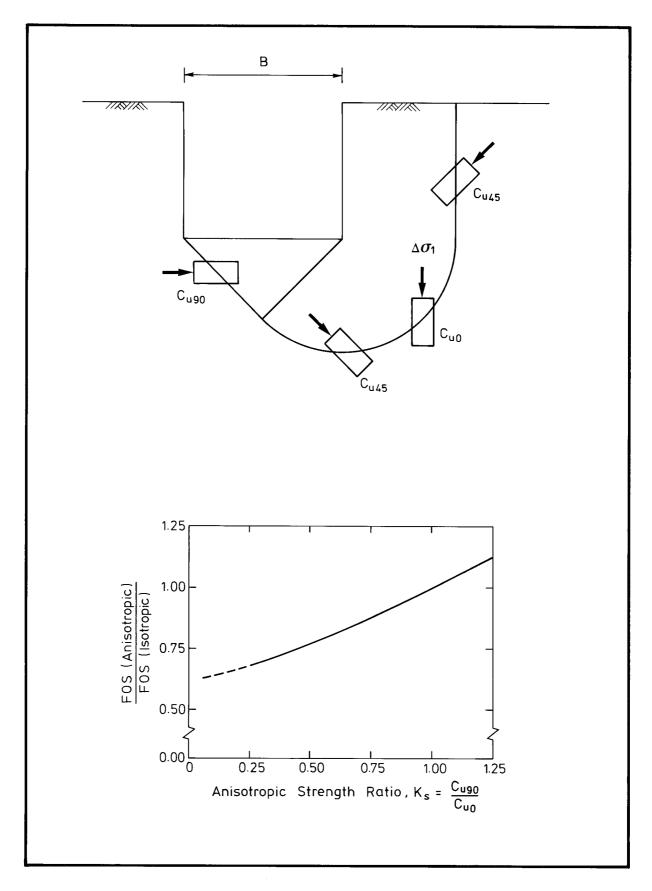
Ratio of Factors of Safety against Basal Heave for Anisotropic Soil to that for Isotropic Soil for Wide Excavation (B > 15 m) (after Clough & Hansen, 1981)
